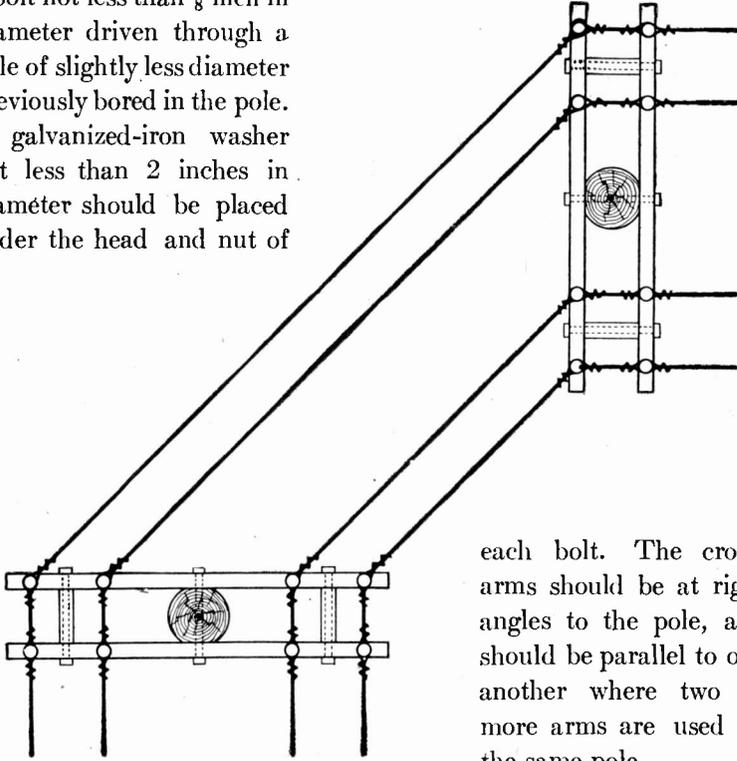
Two-Poles Used in Making Turn on Heavy Line.
